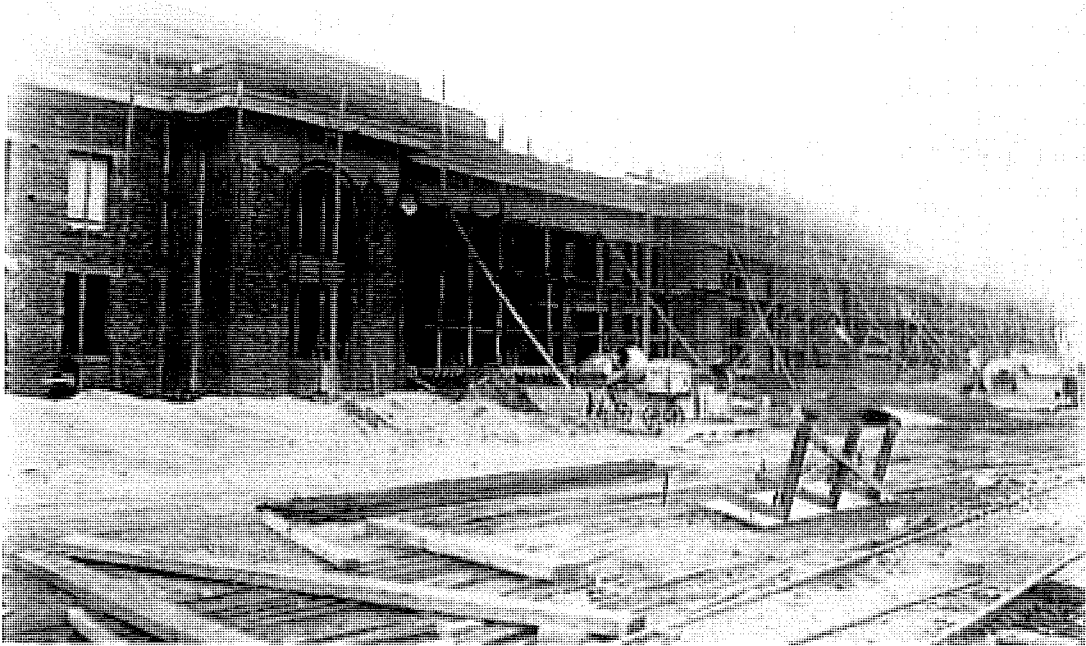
Parliament House prior to rendering (1926), with brickworks railway in foreground.
